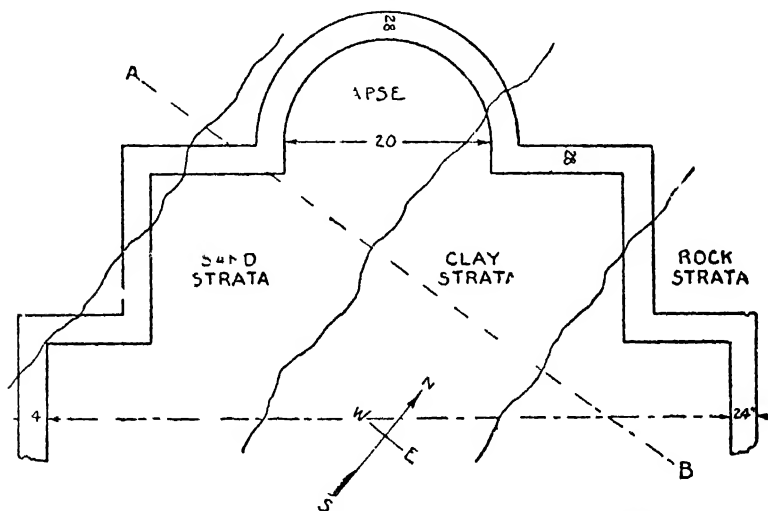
,430 —Foundation plan of part of a church showing various materials, sometimes found in excavating
